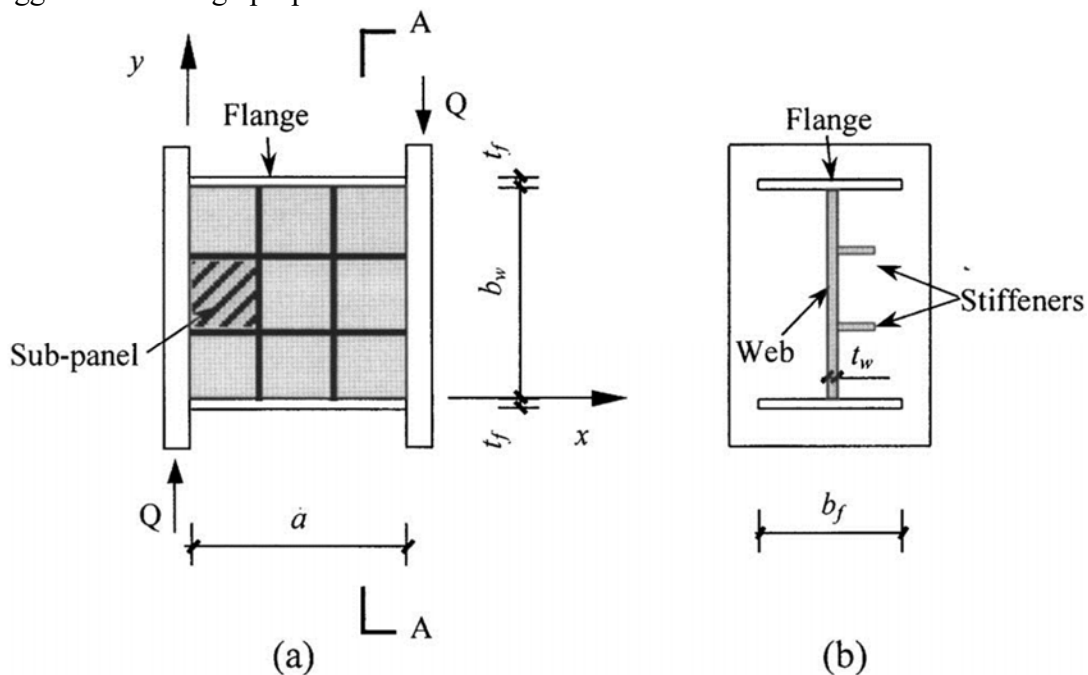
Stiffened Shear Link with Two Pairs of Longitudinal and Transverse Stiffeners: (a) Elevation and (b) View A-A (Chen Z. et al. ,2006)
